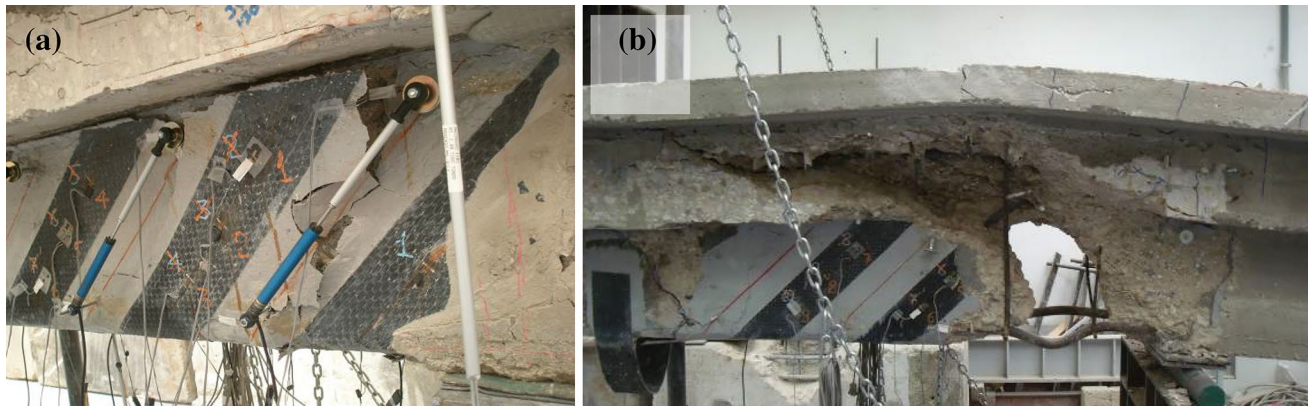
Retrofitted beam S-TM1-B without retrofitting construction defects damage after the failure test: a debonding of C-FRP strips; b concrete diagonal crack and buckling of the longitudinal rebar near the support with negative moments
